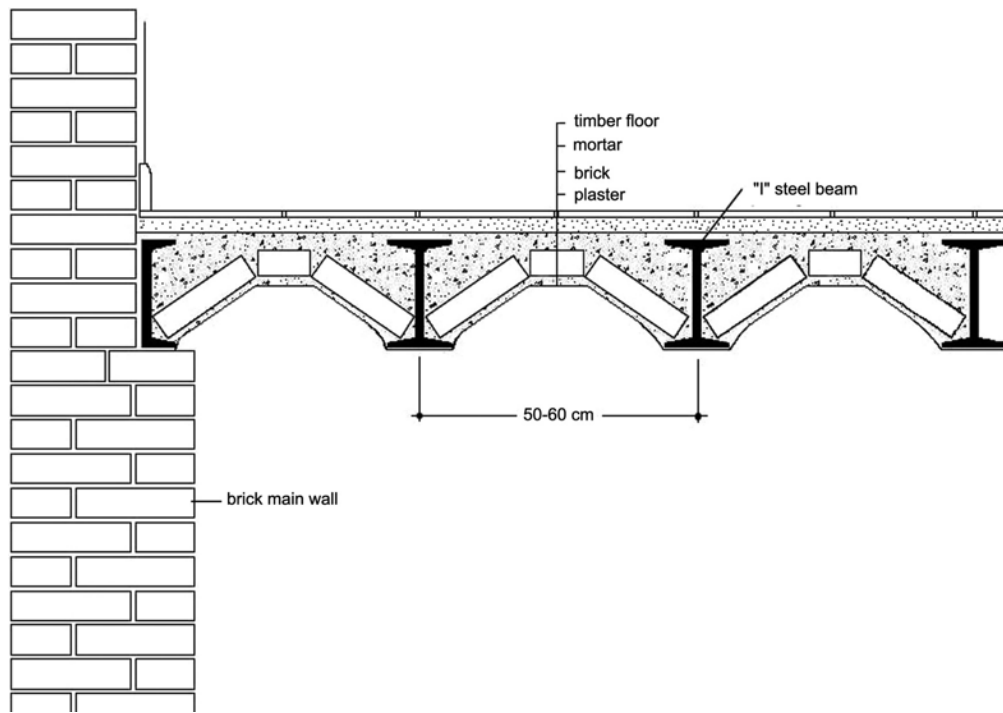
The Jack arched floor system section (Yergün & Çiftçi, 2008)
